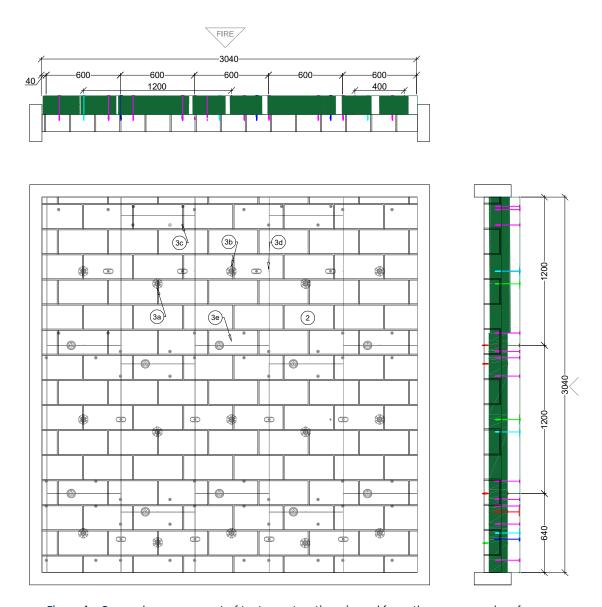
General arrangement of test construction viewed from the unexposed surface
